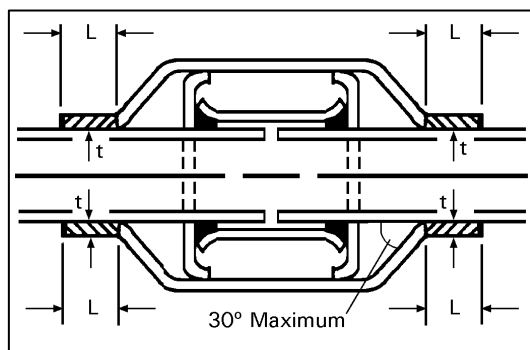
Welded Strapping for Compression or Sleeve Couplings
